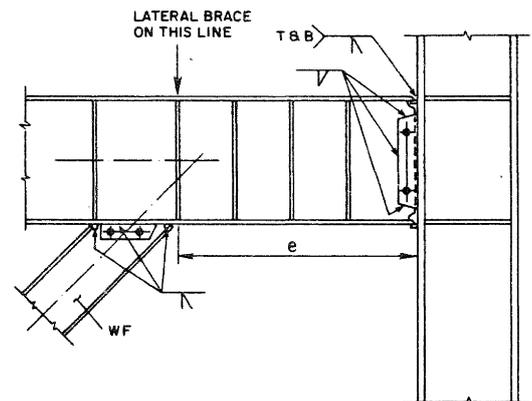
LINK AND BRACE DETAIL ADJACENT TO COLUMN
